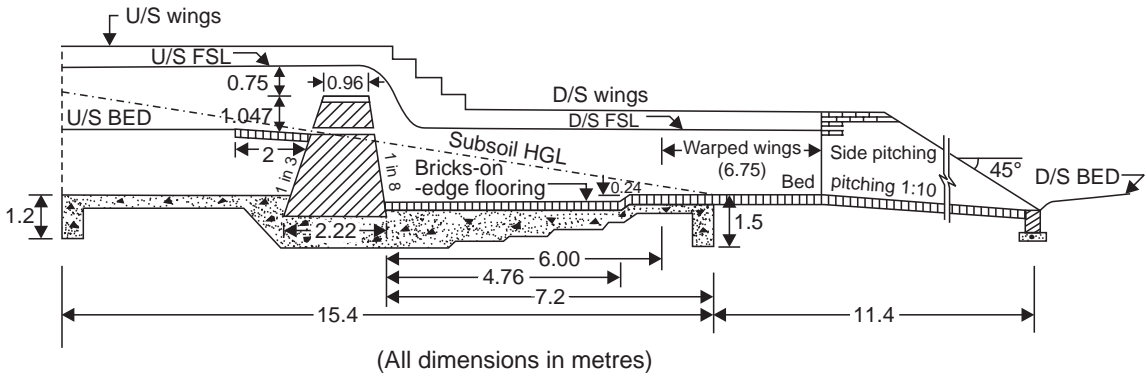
Longitudinal section of Sarda fall (Example 10.1) (not to scale)
